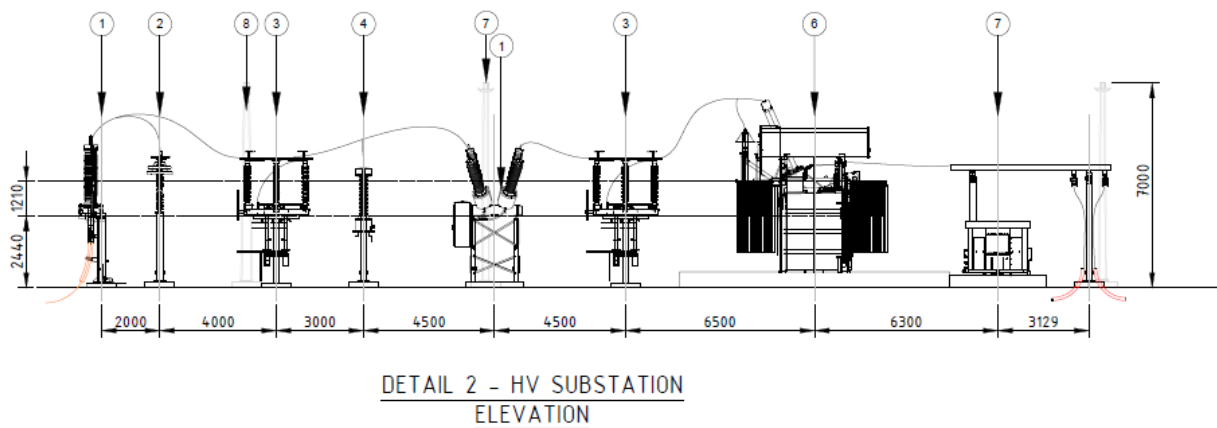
Elevation view of the proposed HV substation indicating height (Source: WSP, 2024)
